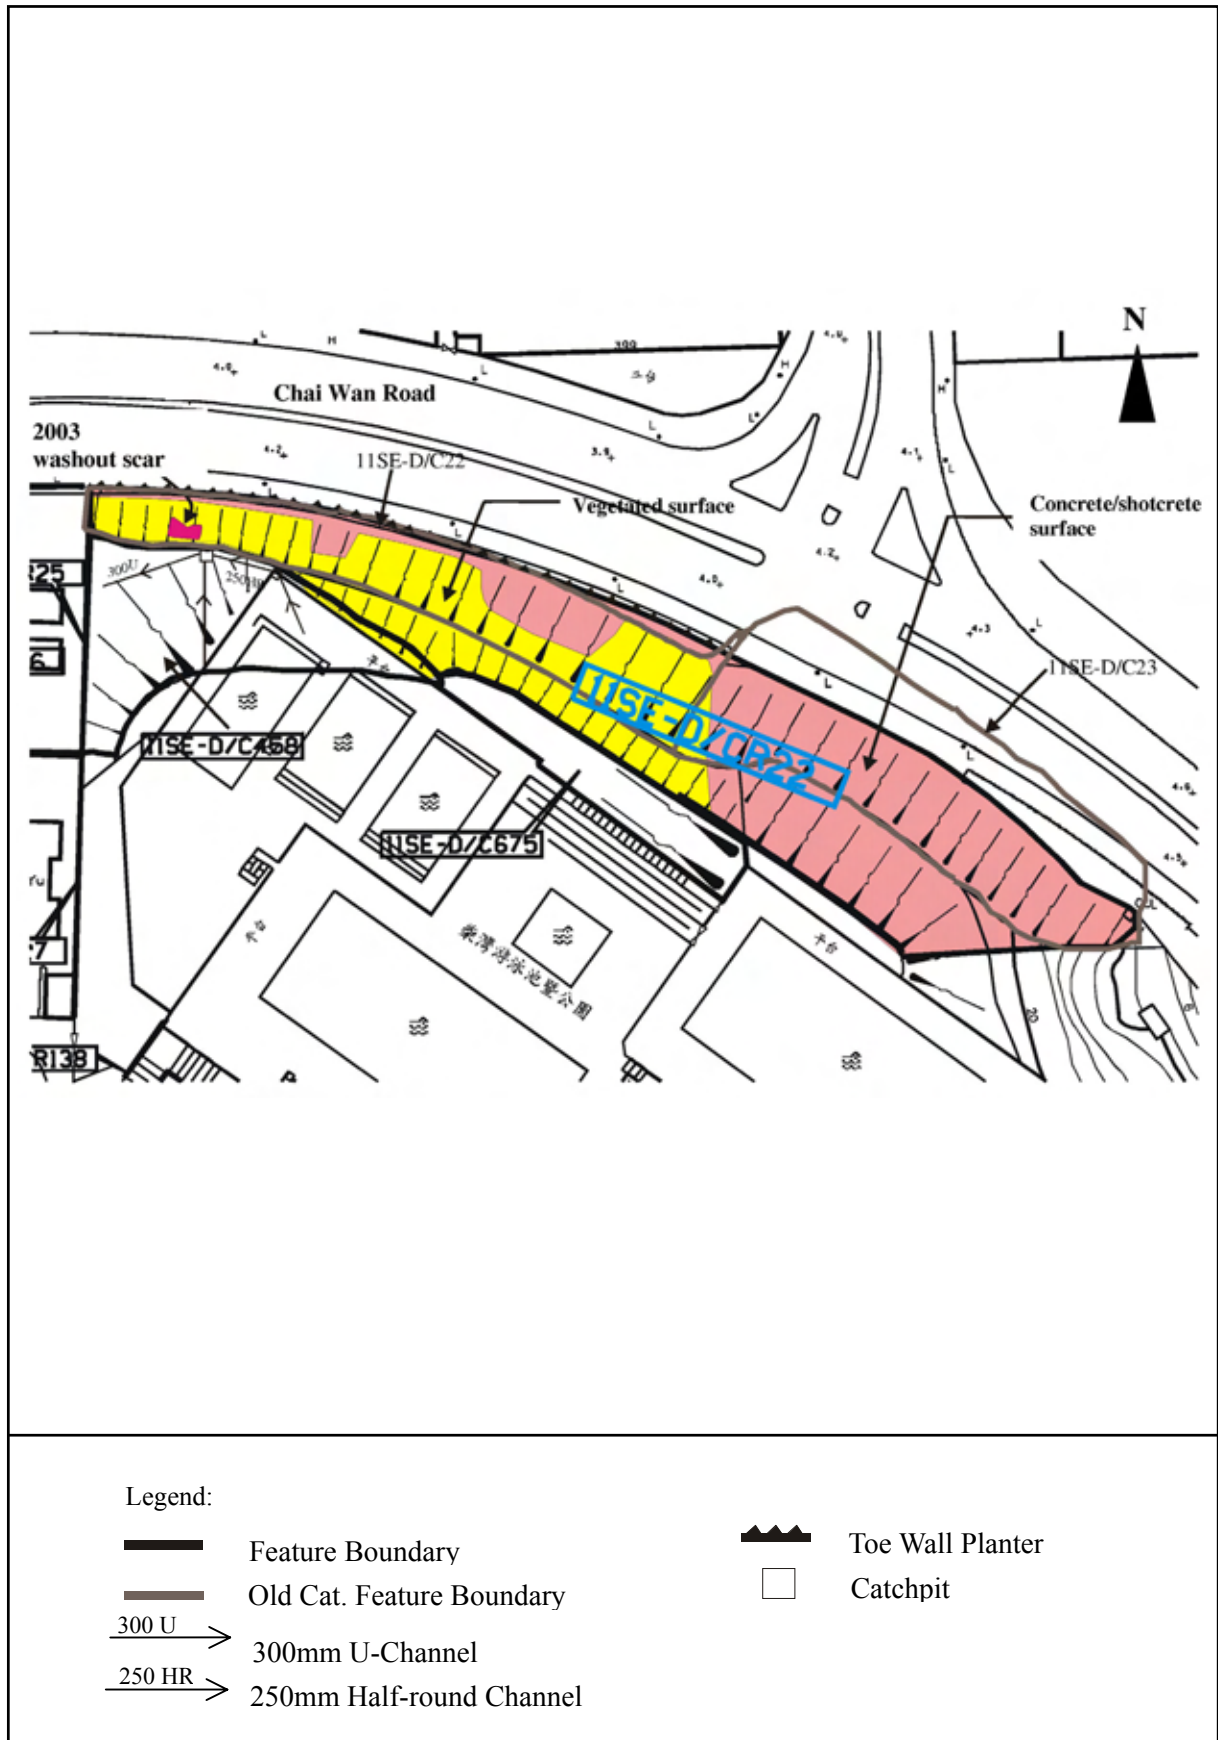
Site Location Plan (Slope No. 11SE-D/C22)
